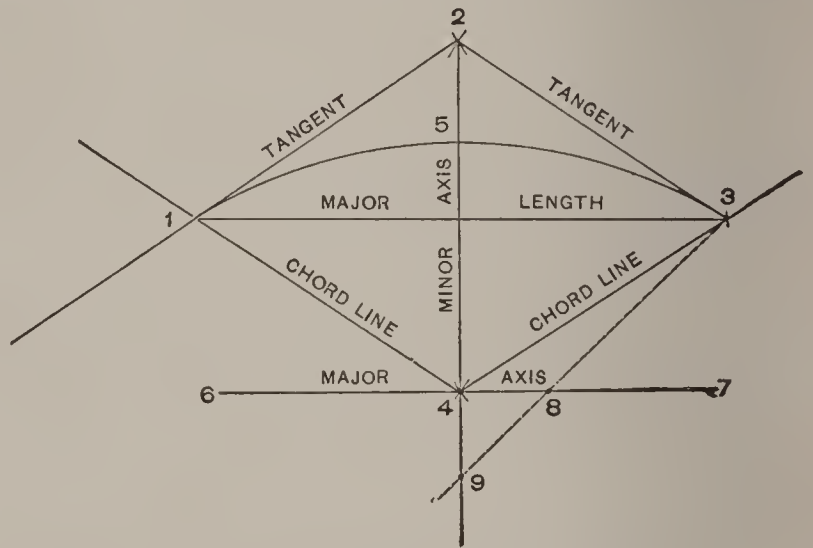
TO DRAW OUTLINE OF MOULD.
